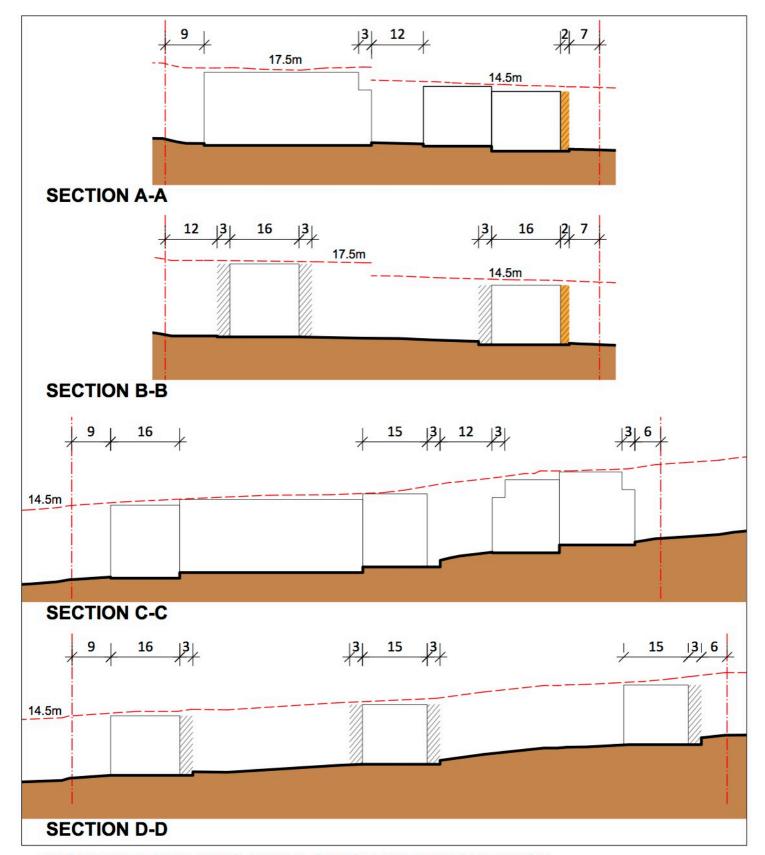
BUILDING ENVELOPES AND ARTICULATION
